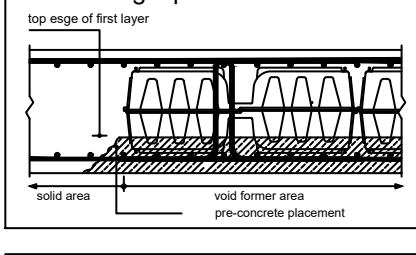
(void former shown schematically) Compression test of hardening of first concrete layer
